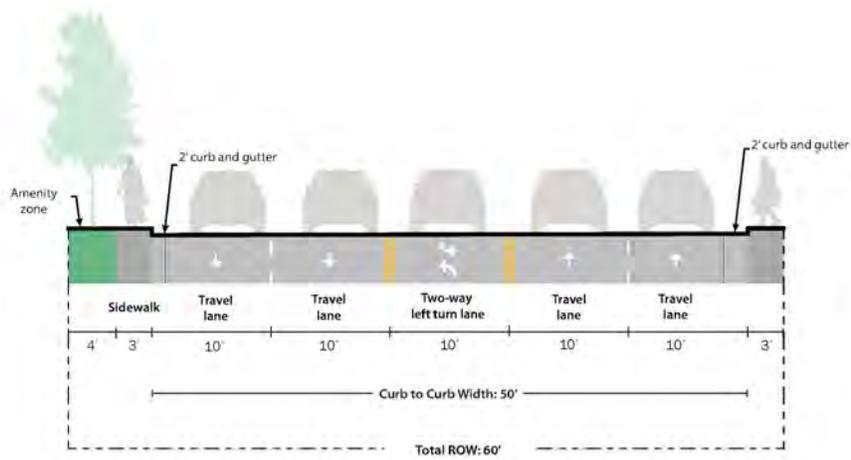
Section F (72nd Avenue West of Raleigh Street – Looking East)
